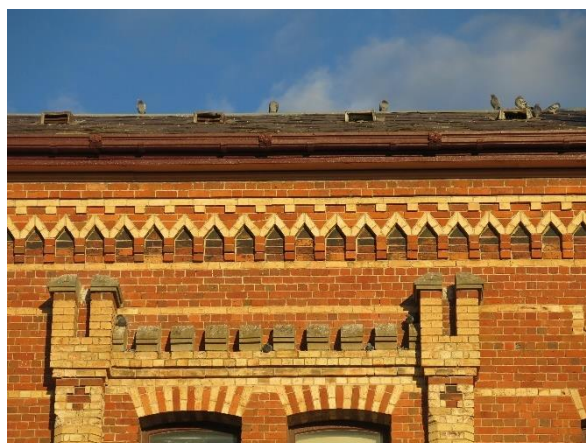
Former Ballarat East Free Library, showing the castellated head-framing detail capped with bluestone, central windows and the polychrome brick detailing to the segmental arch heads, faceted pilasters with capitals decorated with crosses and the lower section of the cornice which features a distinctive polychrome corbel table. (May 2020)
